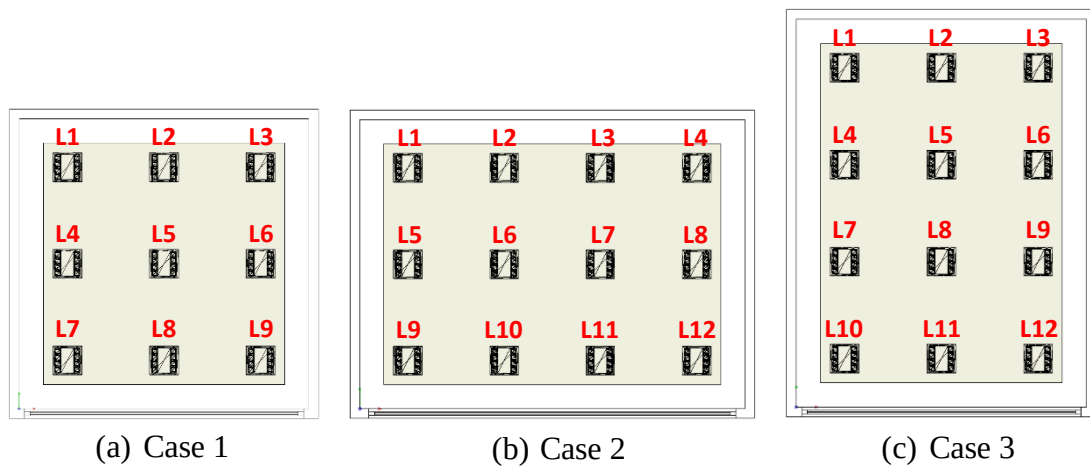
Building layout. (a) Case 1, (b) Case 2, (c) Case 3
